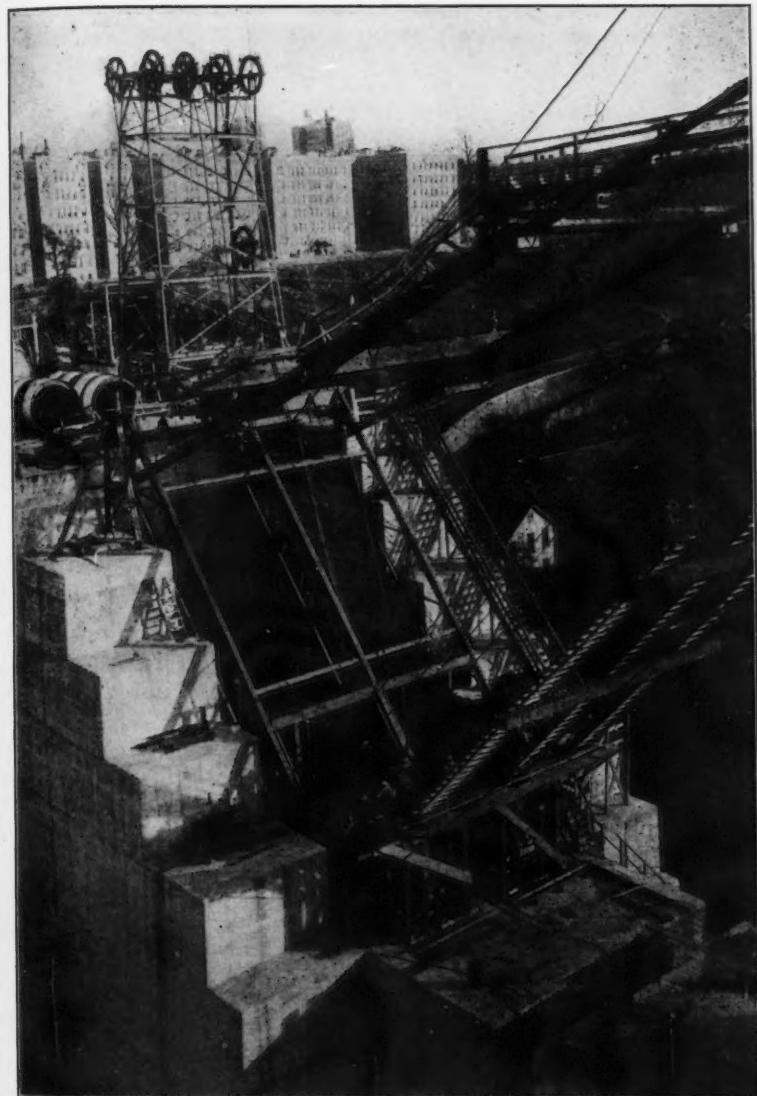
SPINNING EQUIPMENT, NEW YORK ANCHORAGE.
